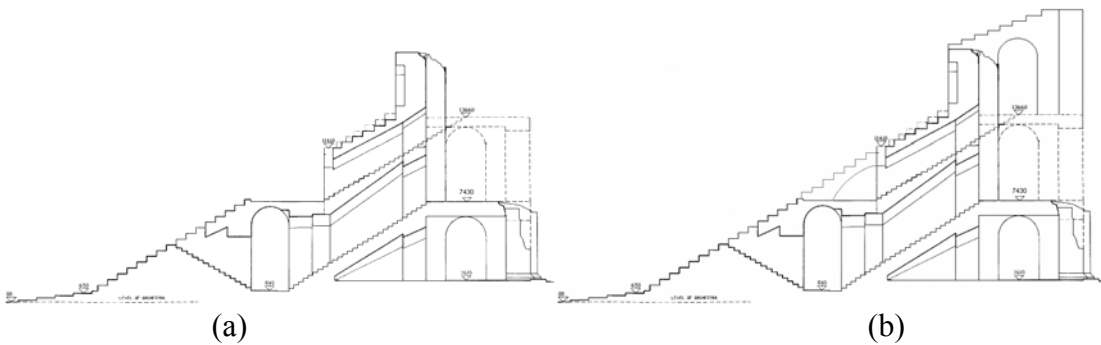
(a) Existing elevation of the theatre and (b) Reconstructed elevation of the theatre
